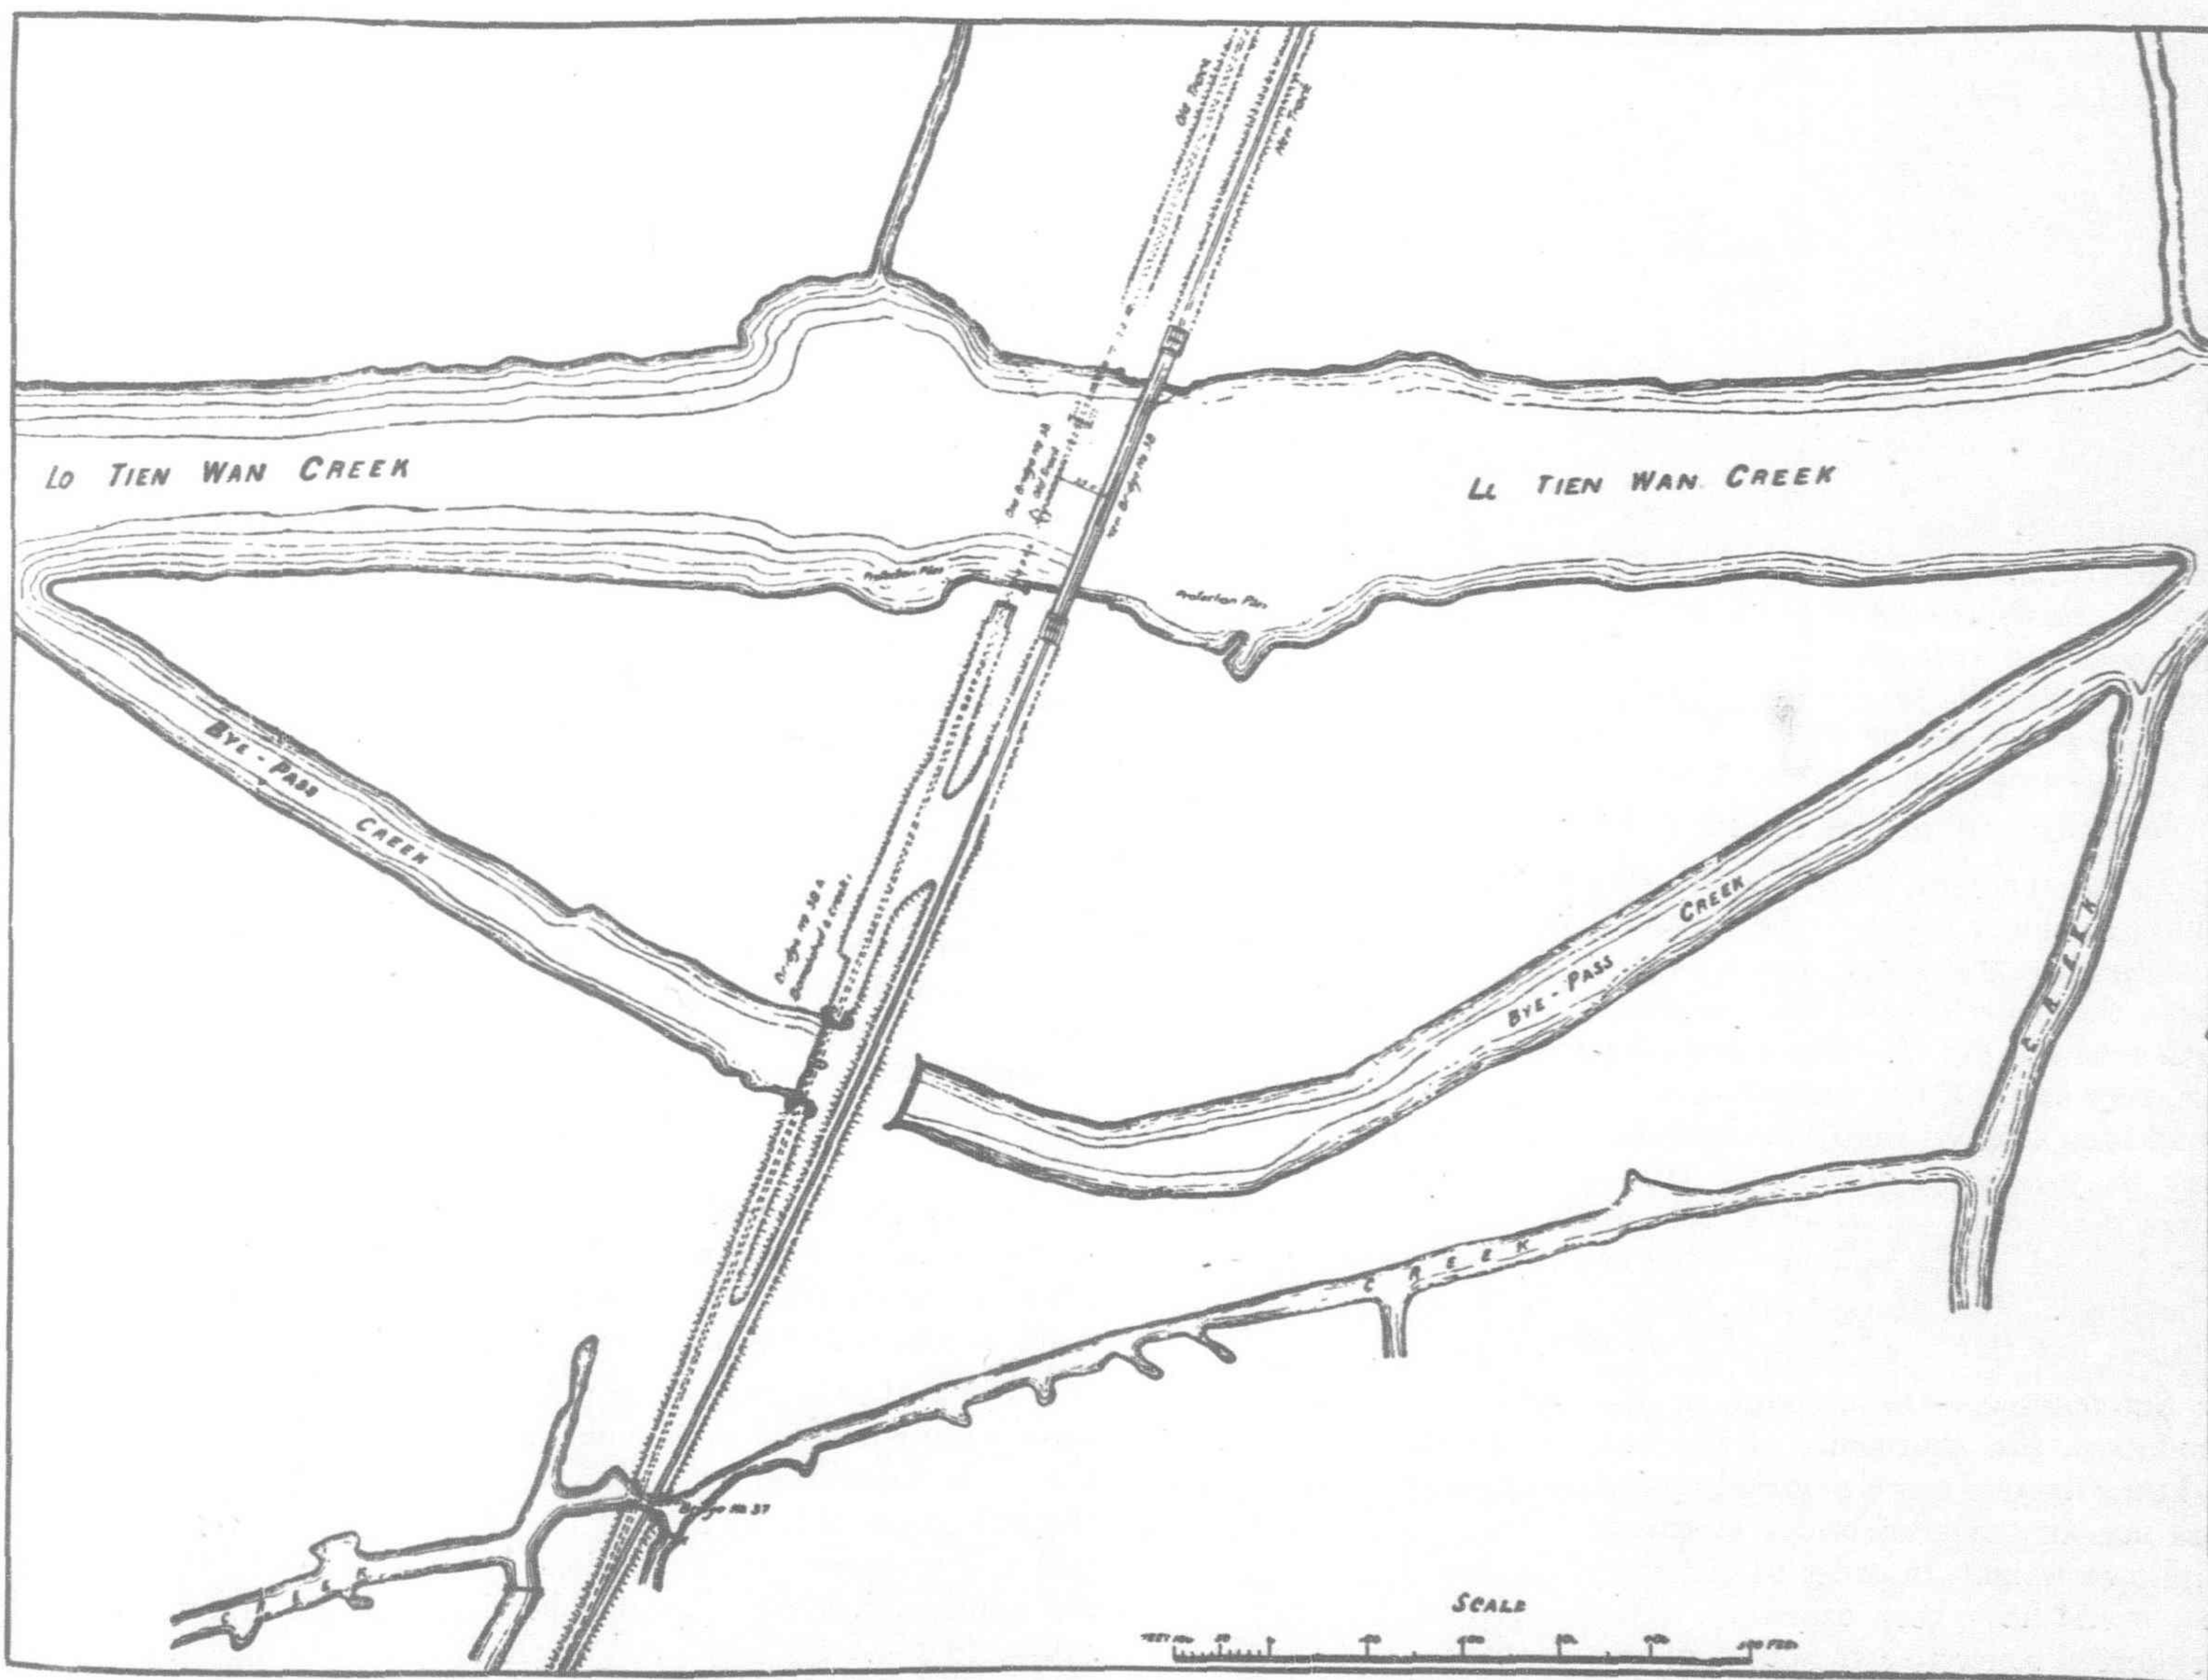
Plan showing Bridge Location, By-Pass Canal and Realignment of Track
